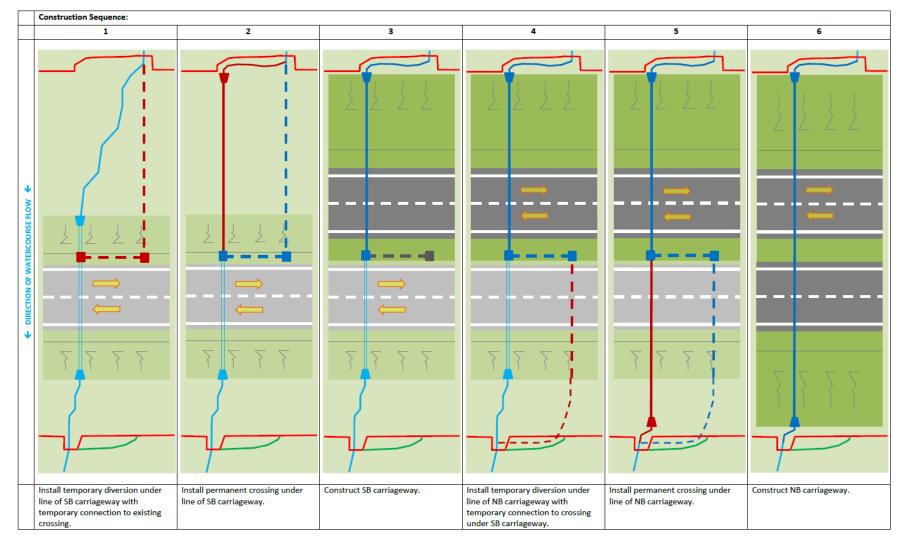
Widening to the east - road on embankment - on-line watercourse alignment
